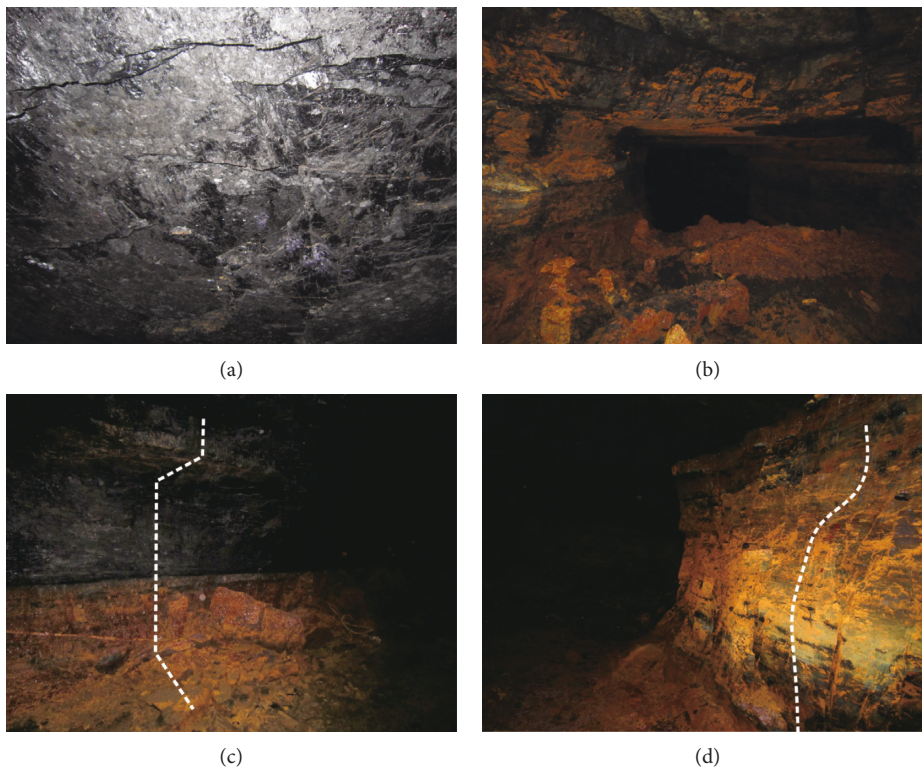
Site photos showing the failure condition of the roof and coal pillars in the #4 seam. (a) Cracks in exposed roof of the #4 seam. (b) Roof caving in one laneway of the #4 seam. (c) Lateral spalling of a coal pillar. (d) Splitting failure of the coal pillar.
